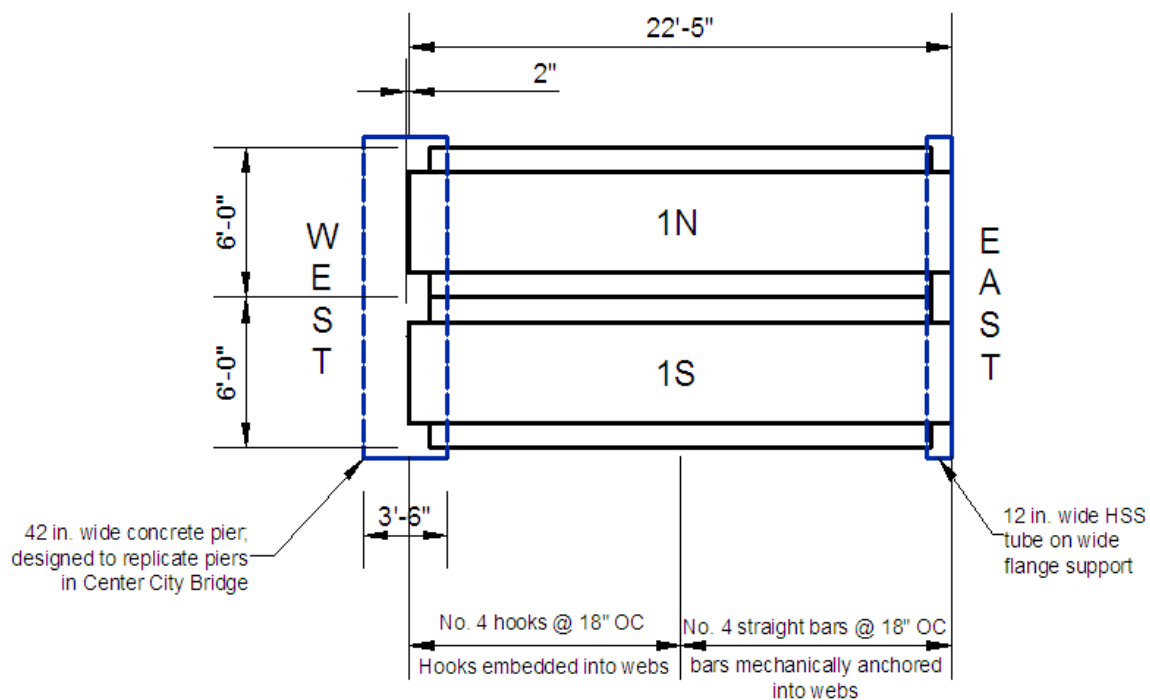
Plan view of the Concept 2 laboratory bridge specimen, including support locations and relevant dimensions. Transverse reinforcement near longitudinal precast joint is not included for clarity
